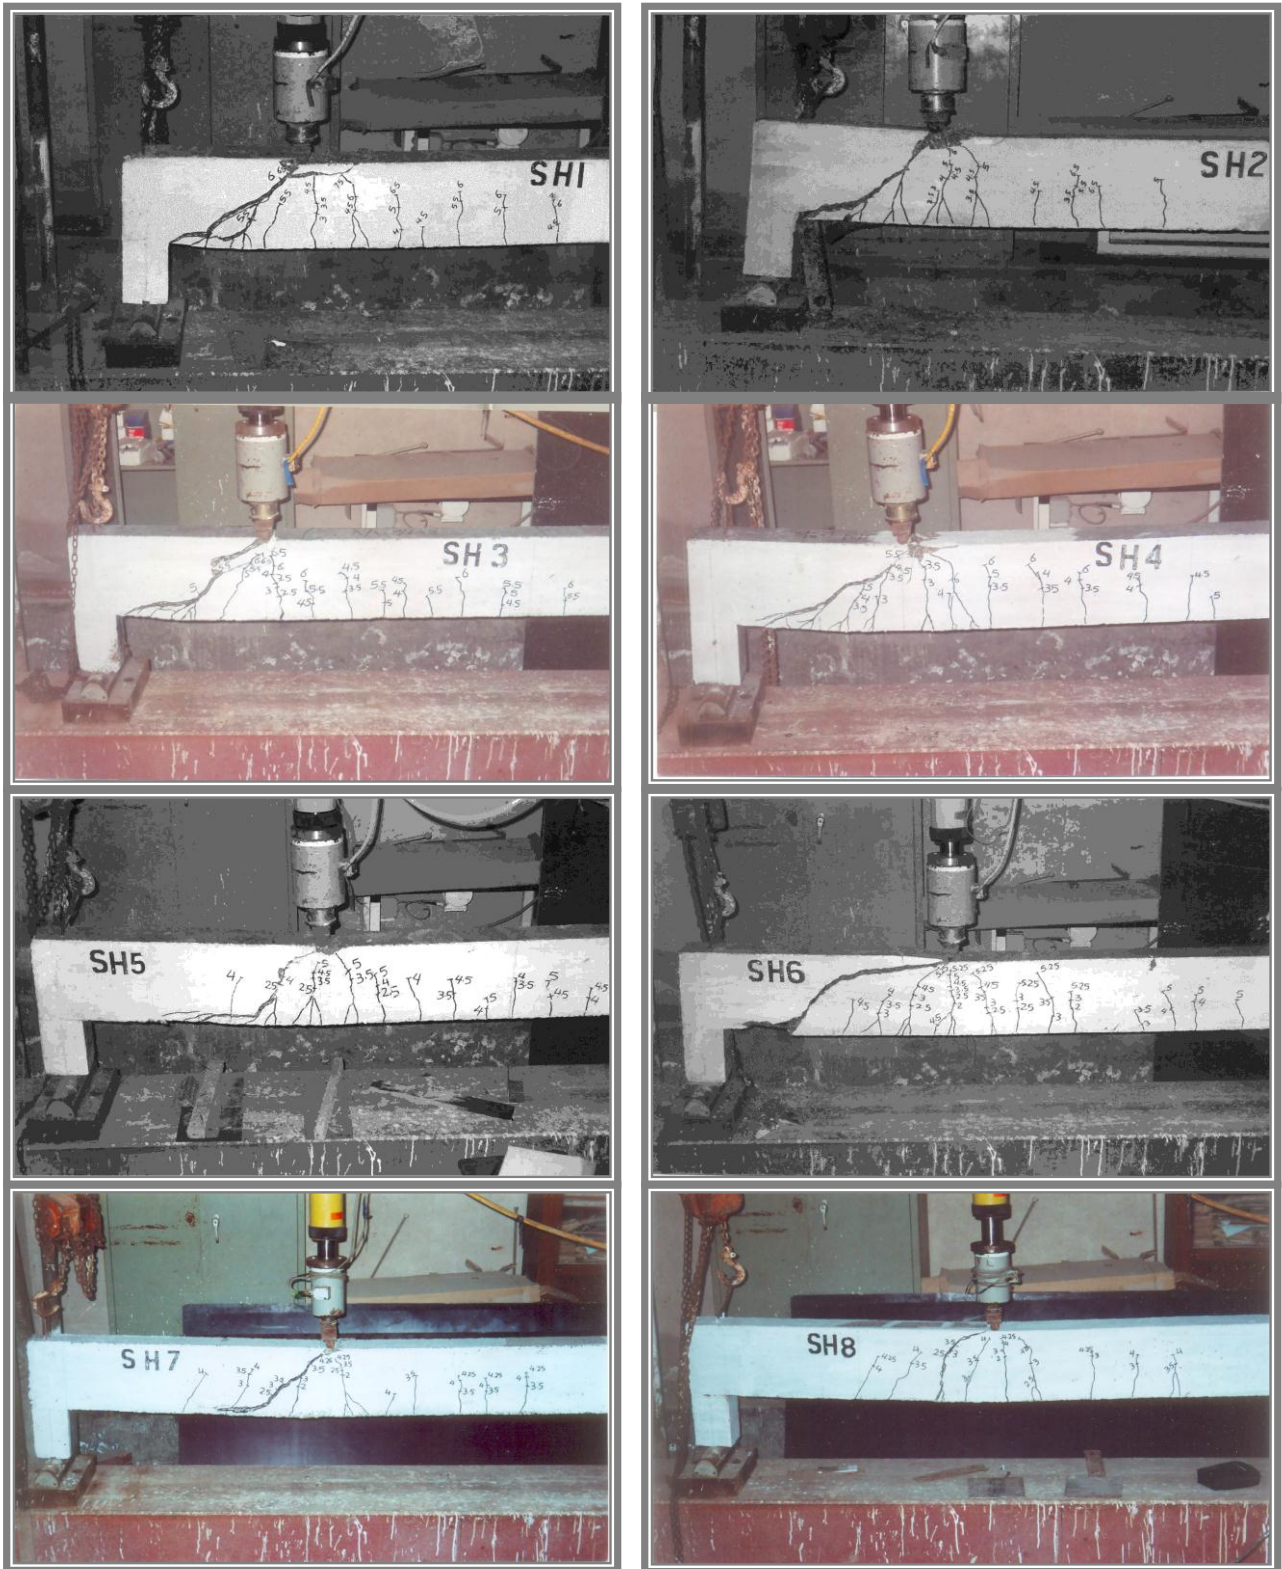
Cracking patterns after failure for tested high strength concrete beams without stirrups in group "H1".
